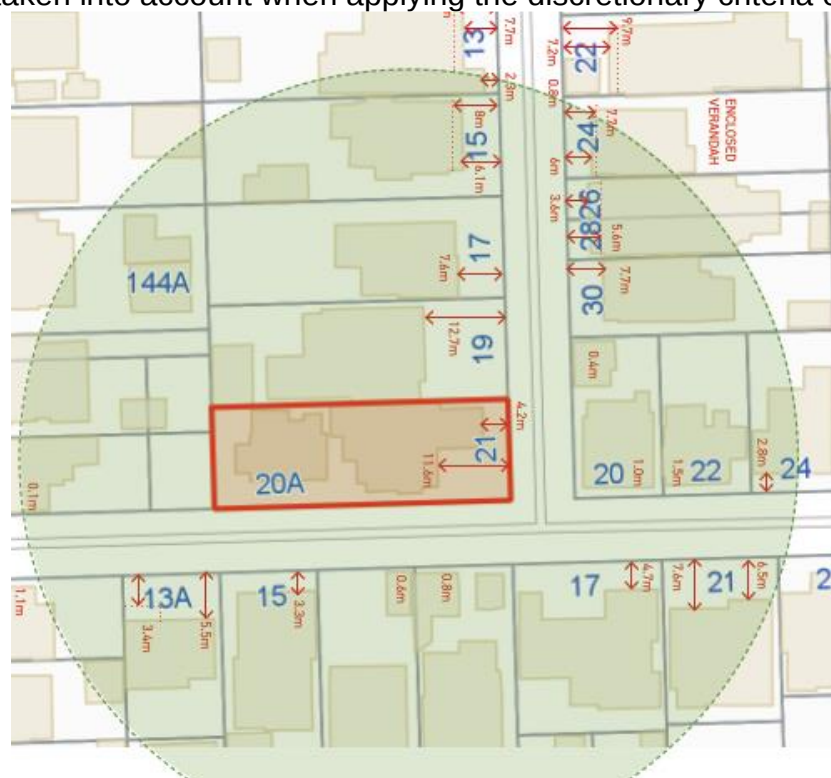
Existing streetscape setbacks, illustrating the setbacks of the properties in the prevailing streetscape as well as the broader streetscape.
